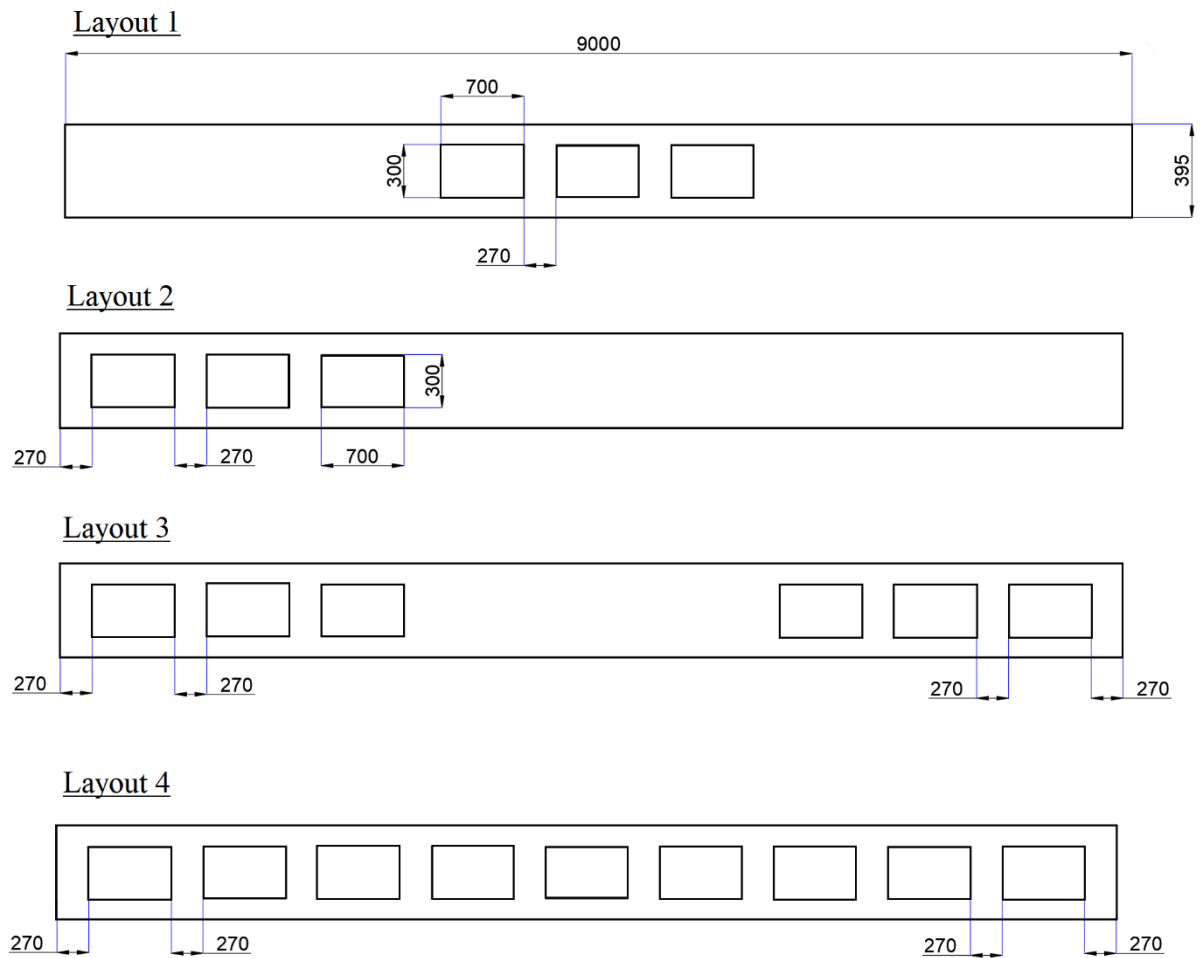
Schematic of opening layout (all dimensions are in mm)
